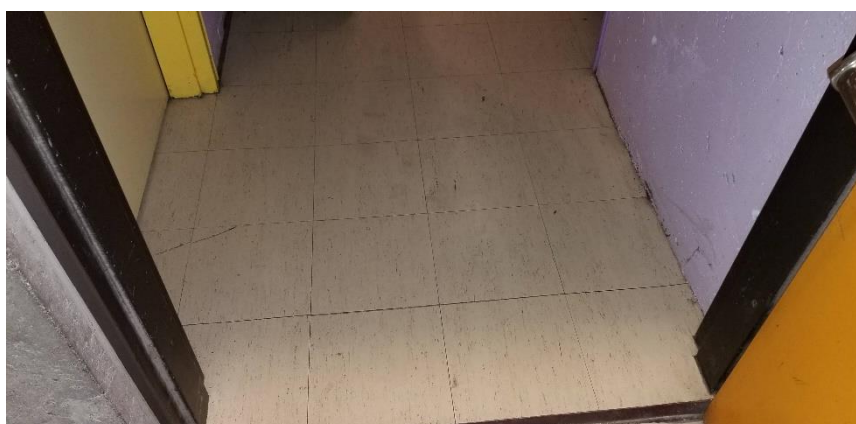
View of previously identified asbestos-containing vinyl floor tiles (12"x12"- Beige with Brown Spots) observed to be in good condition in the hallway of 002 and in adjacent rooms.
